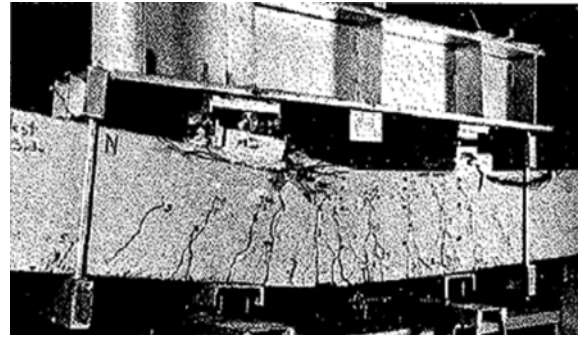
Test result of prestressed beams with unbonded tendons and bonded reinforcement²⁾
